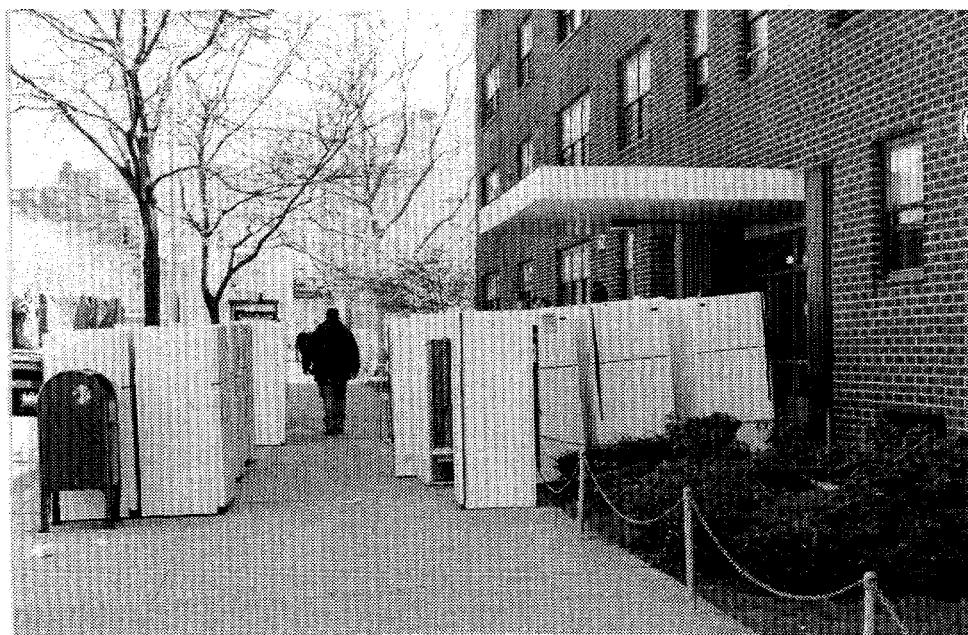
shows new Maytag refrigerators being unloaded. About 100 refrigerators were installed on a typical working day. The new refrigerators were placed on the sidewalk until the installation crew could gain access to each apartment and remove the existing refrigerator, as shown in Figure 2.3. For apartments where the residents were not home or refused access, or where the apartments were vacant because they were being remodeled, new refrigerators were placed in storage at the development for installation by the year's end. Also approximately 1% of the new refrigerators were placed in storage as spares for failures occurring after the warranty period has expired. Some apartments did not have room for the larger (15-ft<sup>3</sup>) refrigerators. These apartments were skipped in 1996 and 1997. An efficient 12-ft<sup>3</sup> model will be supplied beginning in 1998.
